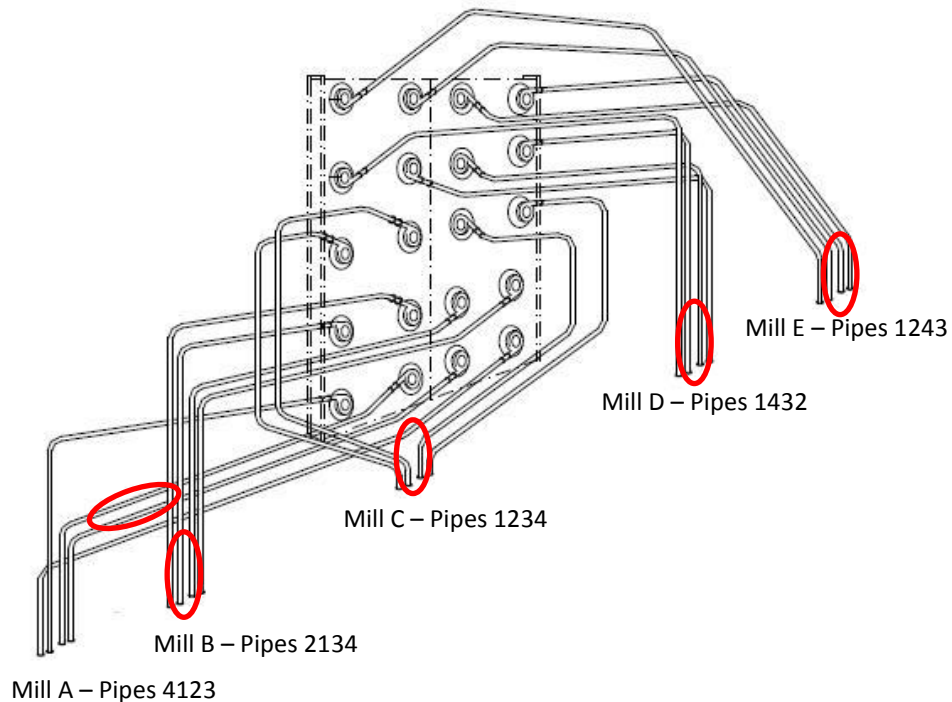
Camden PF pipe layout and measurement locations (CMP, 2010)
